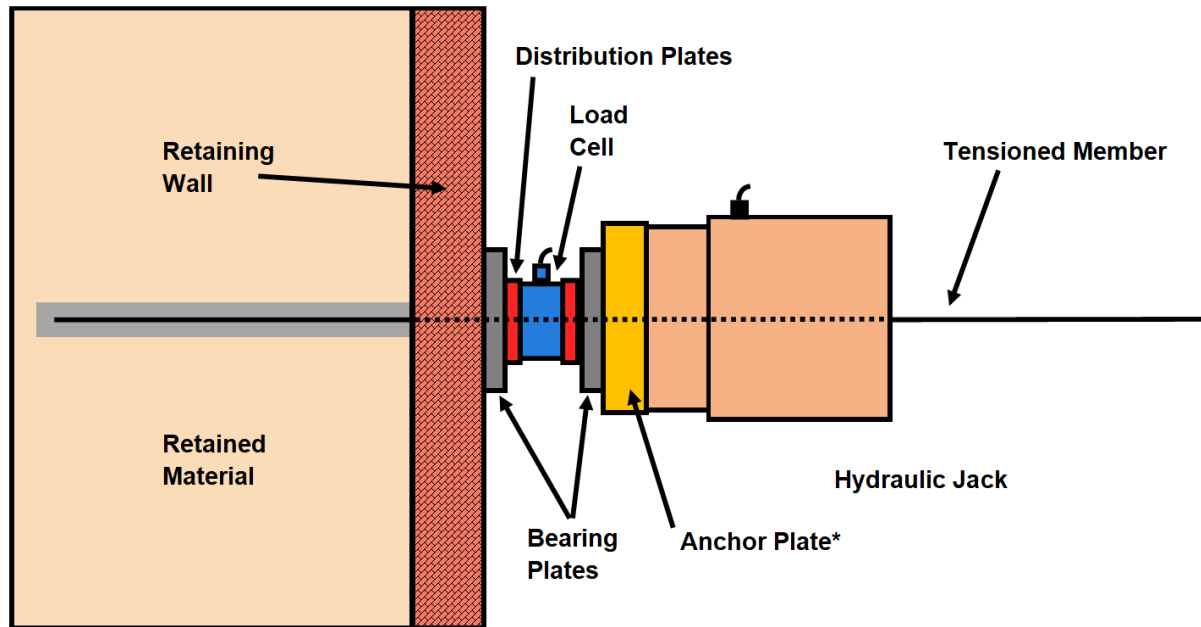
Anchor load cell installed between retaining wall and a tensioning jack
